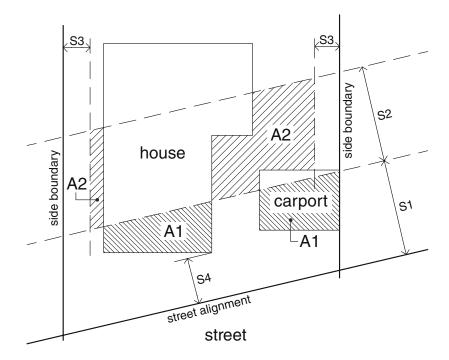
Measuring primary street setbacks (clause 5.1.2 C2.1iii)
